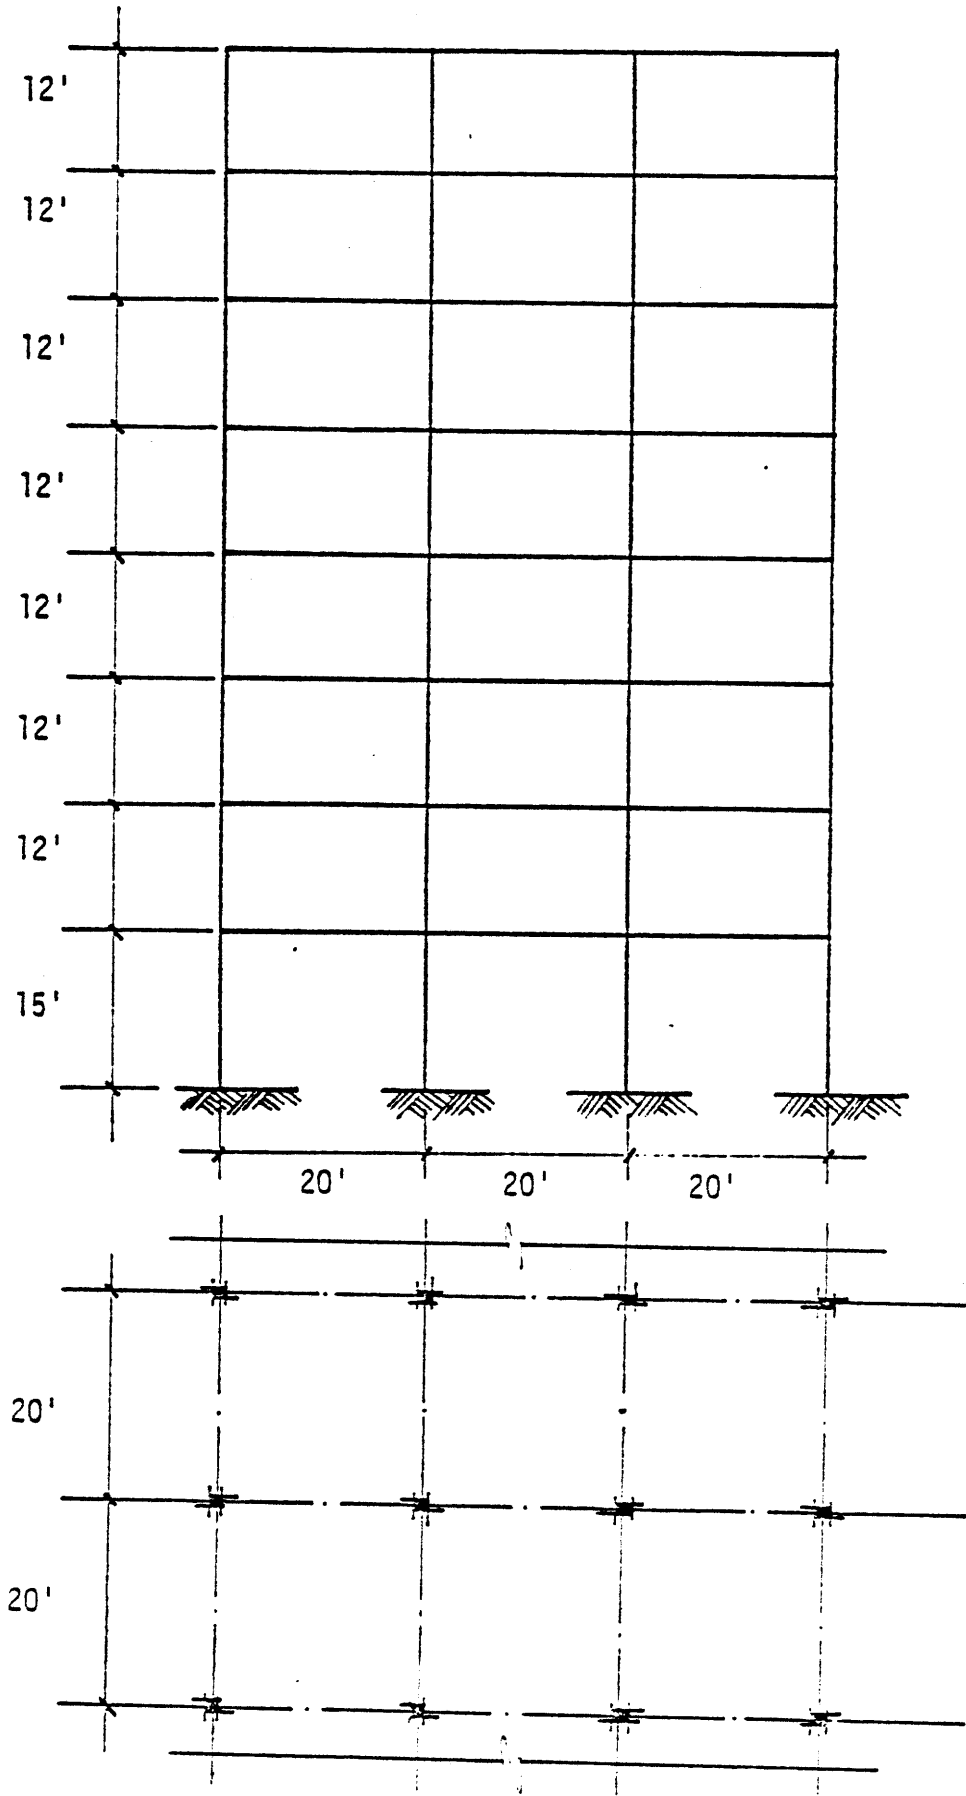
ELEVATION AND PLAN VIEW OF 8-STORY BUILDING FRAME
